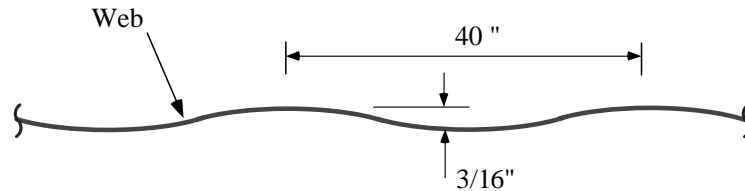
Plan View of Typical Web Imperfections for Rectangular Girder
